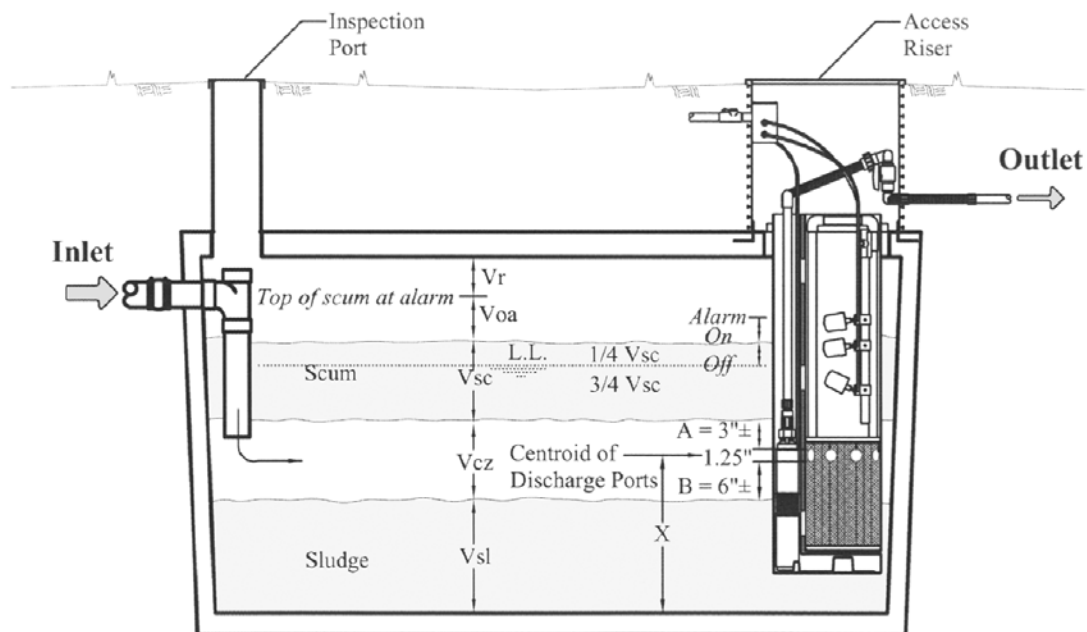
Typical 1,000 gallon concrete design septic tank with a pump vault
